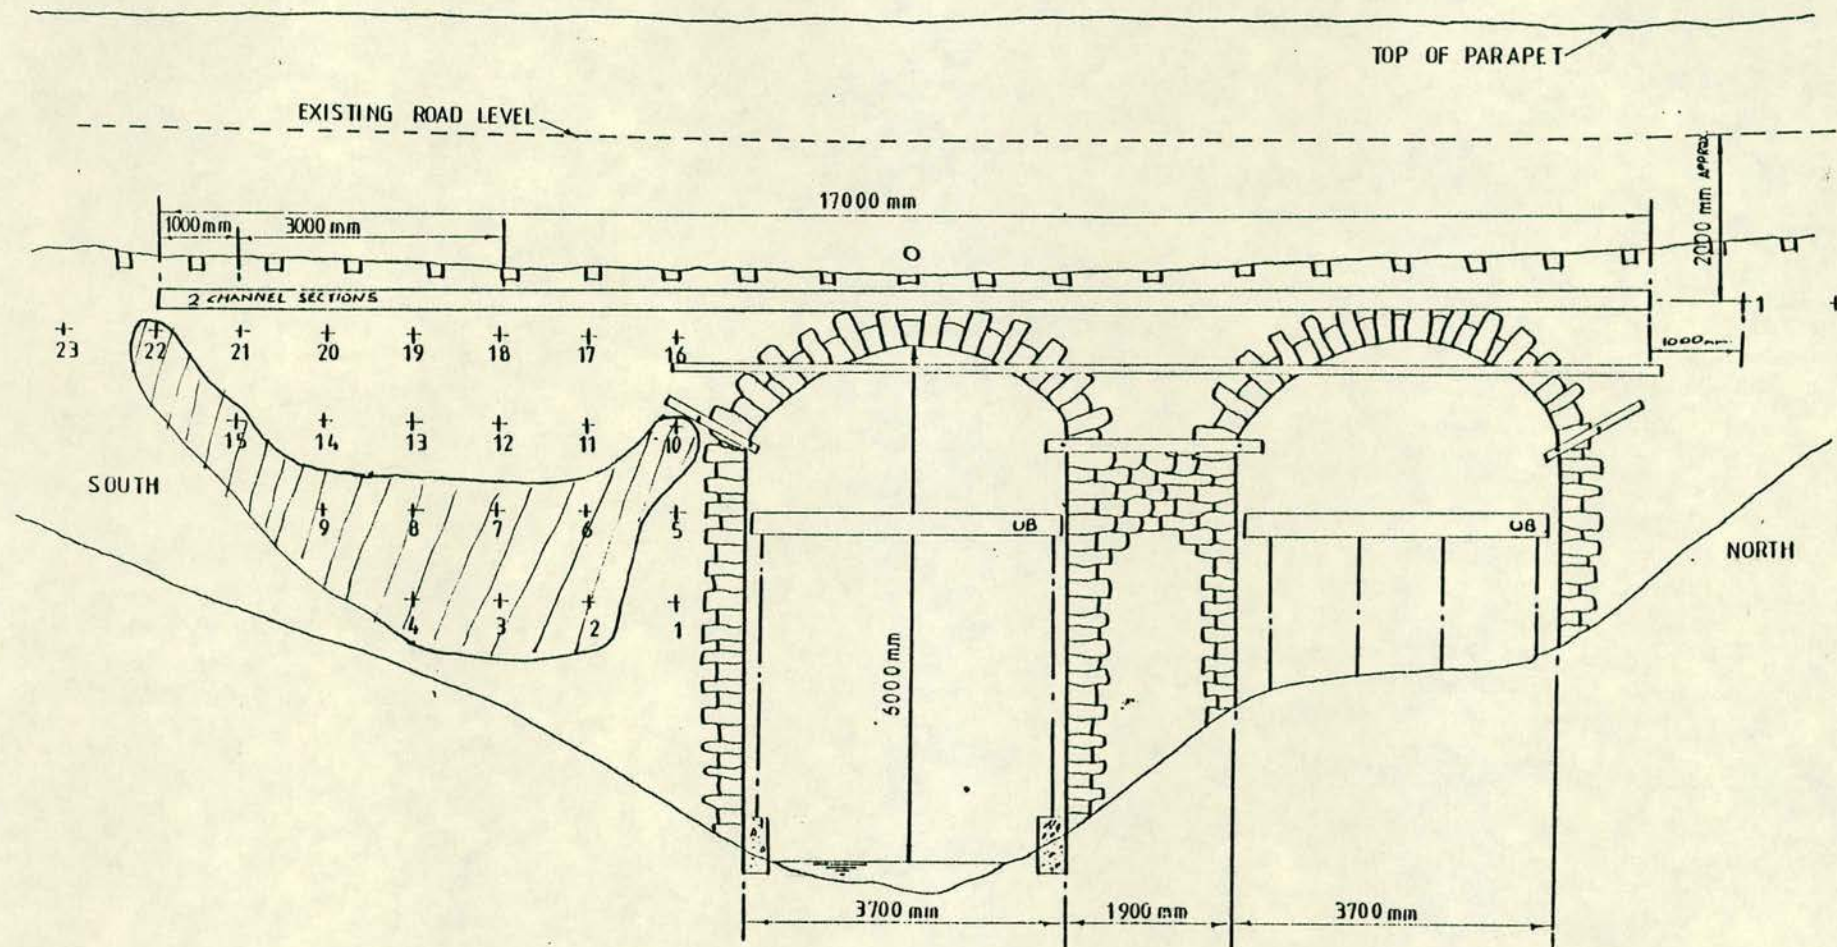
Middleton North Burn Bridge, downstream elevation, suspected void area (shaded) before grouting
